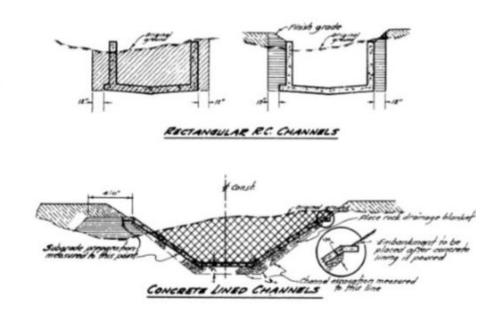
Cross sections of rectangular reinforced concrete and trapezoidal concrete lined channels. (Source: Garden Grove-Wintersburg Channel drawings, U.S. Army Corps of Engineers, Los Angeles District)
